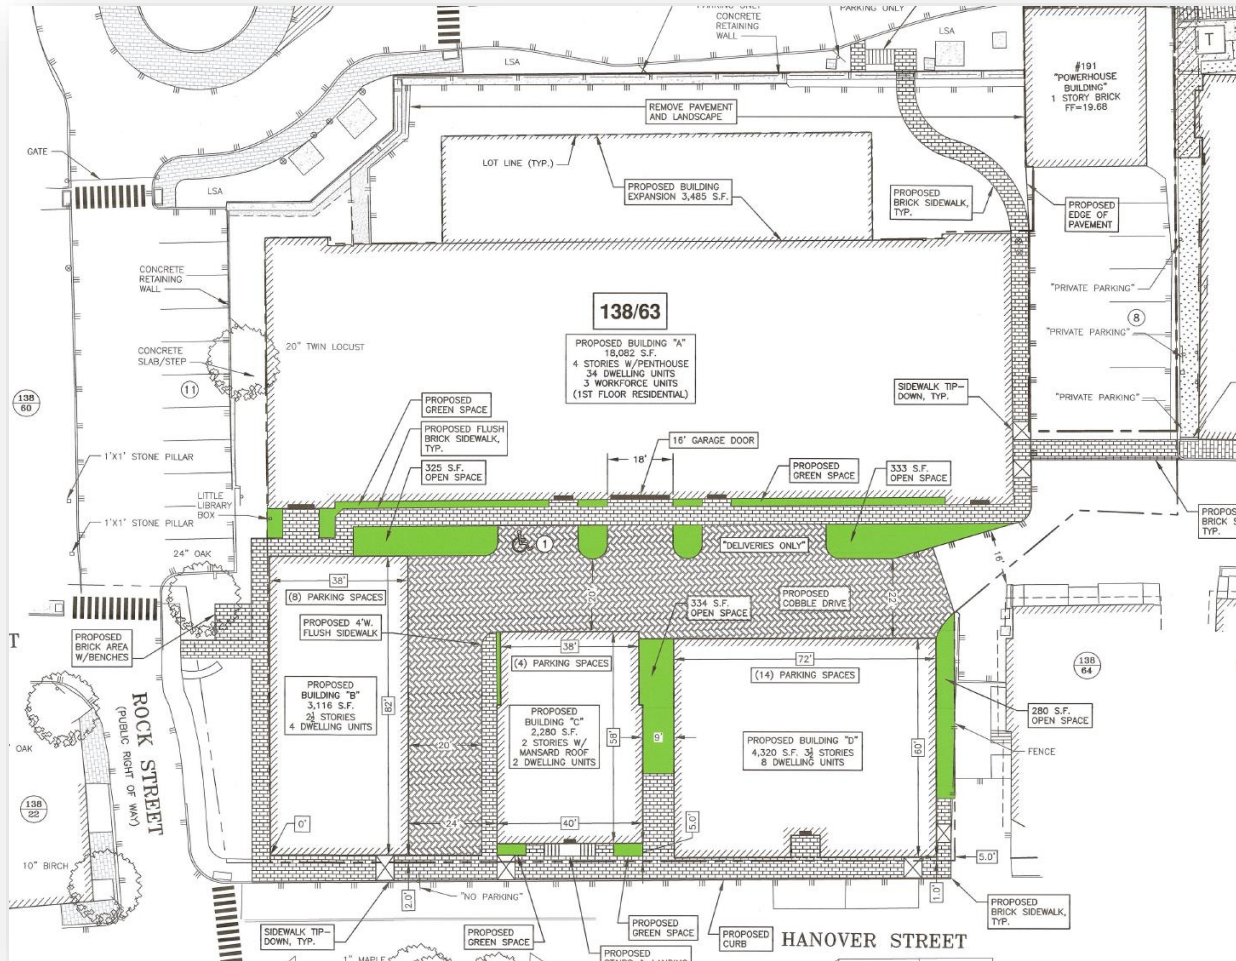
A Site Plan of the Proposed Alternative CUP Plan (July 2024)
